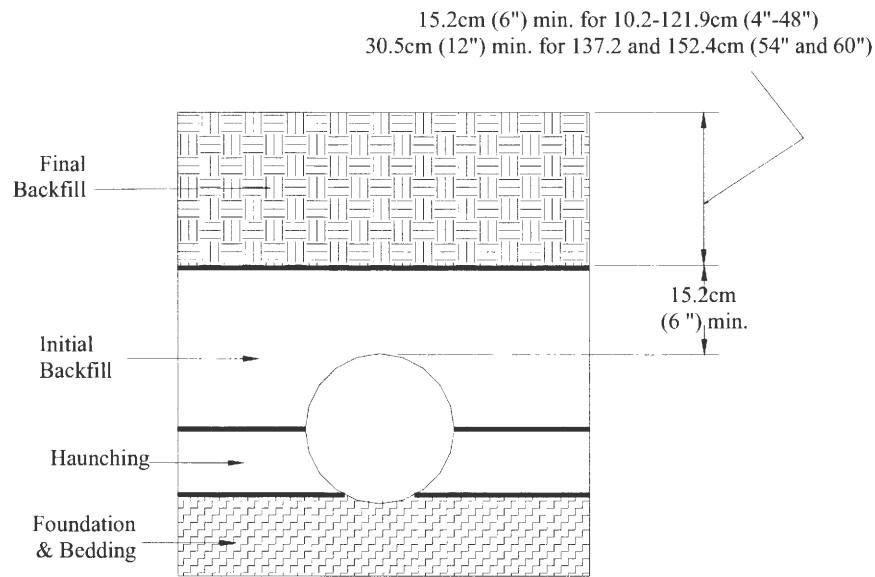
Typical backfill cross-section for thermoplastic pipes (from Hancor Inc 2000).
